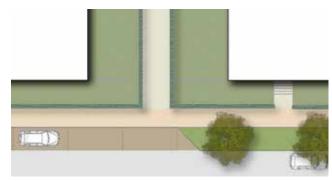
Illustrative diagram showing an indicative layout of on-street inset parking.
